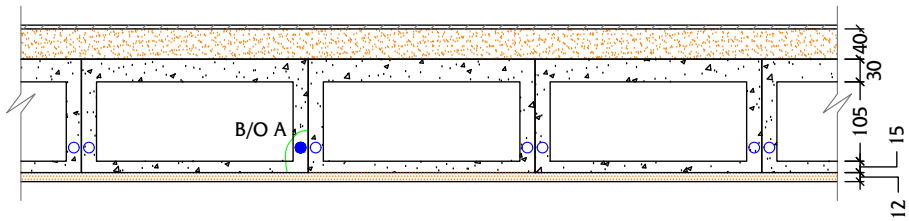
PART SECTION LOOKING SOUTH THROUGH ROOF SLAB SHOWING DETAILS OF PRECAST CONCRETE PLANK - SURVEY AREA RS1 SCALE 1:5
